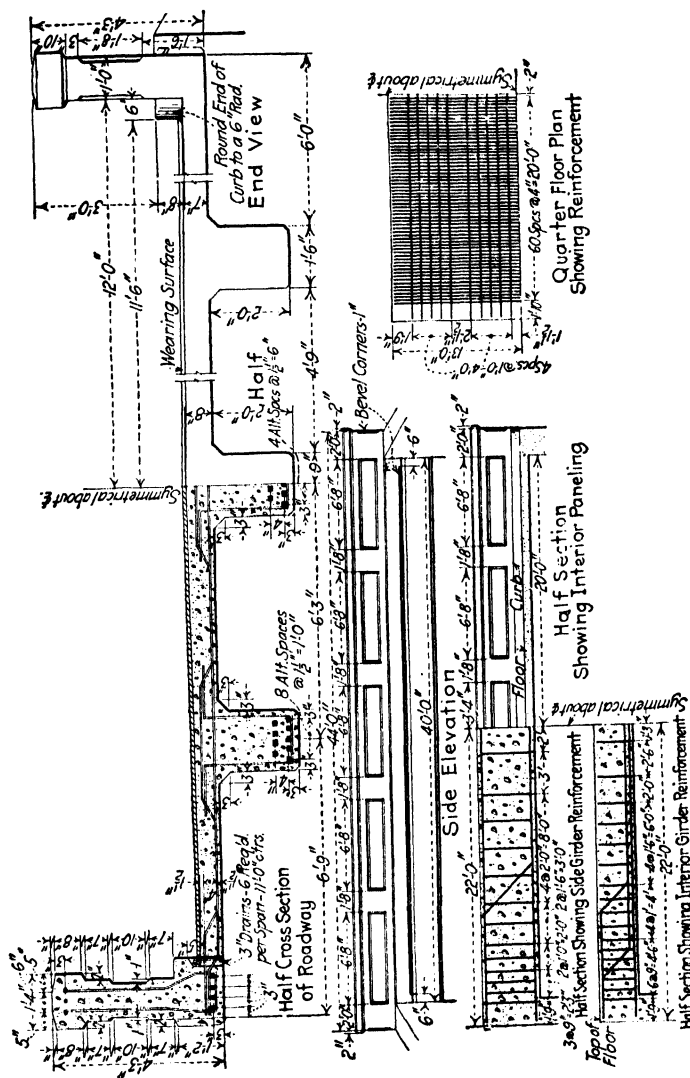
Deck reinforced concrete girder bridge, Wisconsin Highway Commission.
